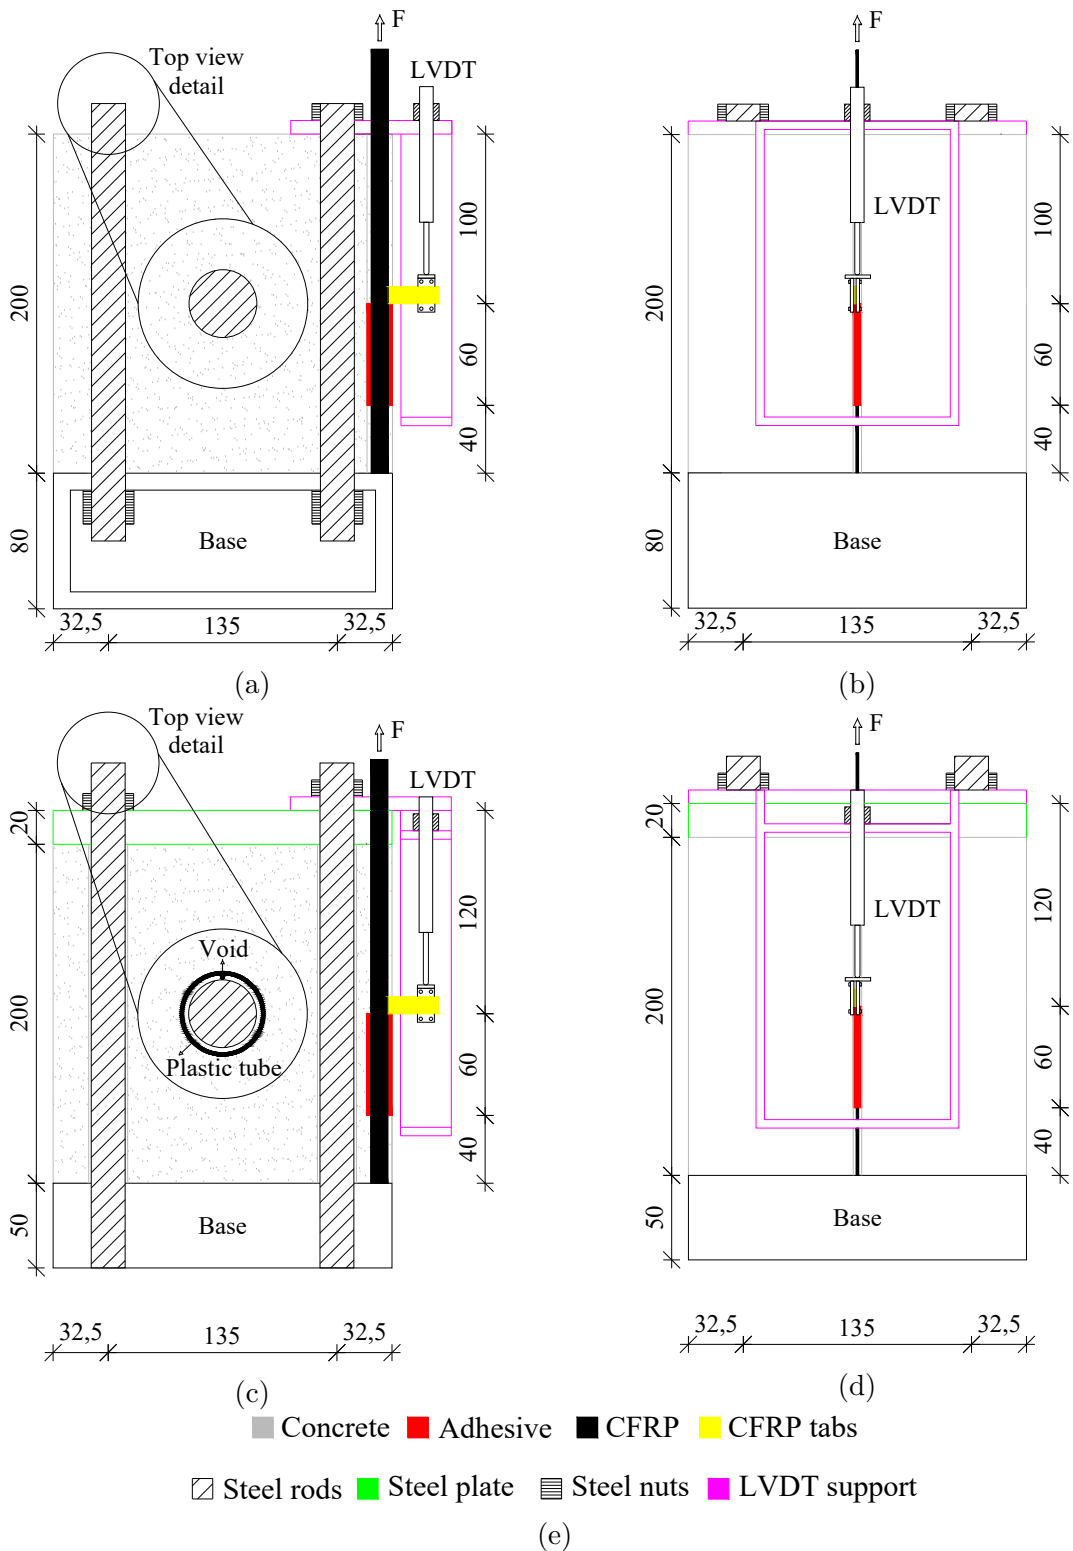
Geometry and test setup of direct pullout tests in: tension – middle section (a) and front view (b); compression – middle section (c) and front view (d). Note: the units are in millimetres.
